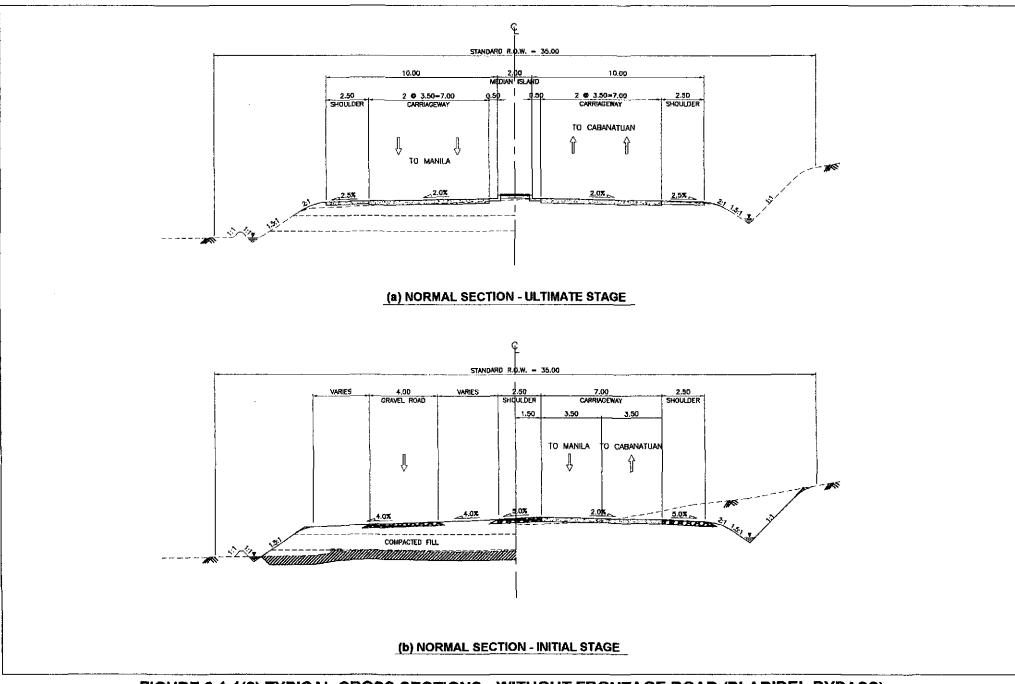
(2) TYPICAL CROSS SECTIONS - WITHOUT FRONTAGE ROAD (PLARIDEL BYPASS)
